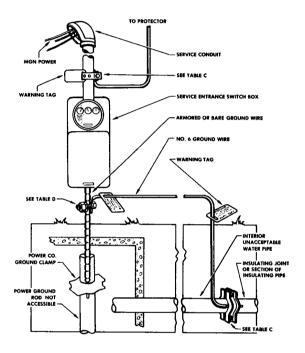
MGN Power Grounded to Inaccessible Ground Rod—Unacceptable Interior Water System
